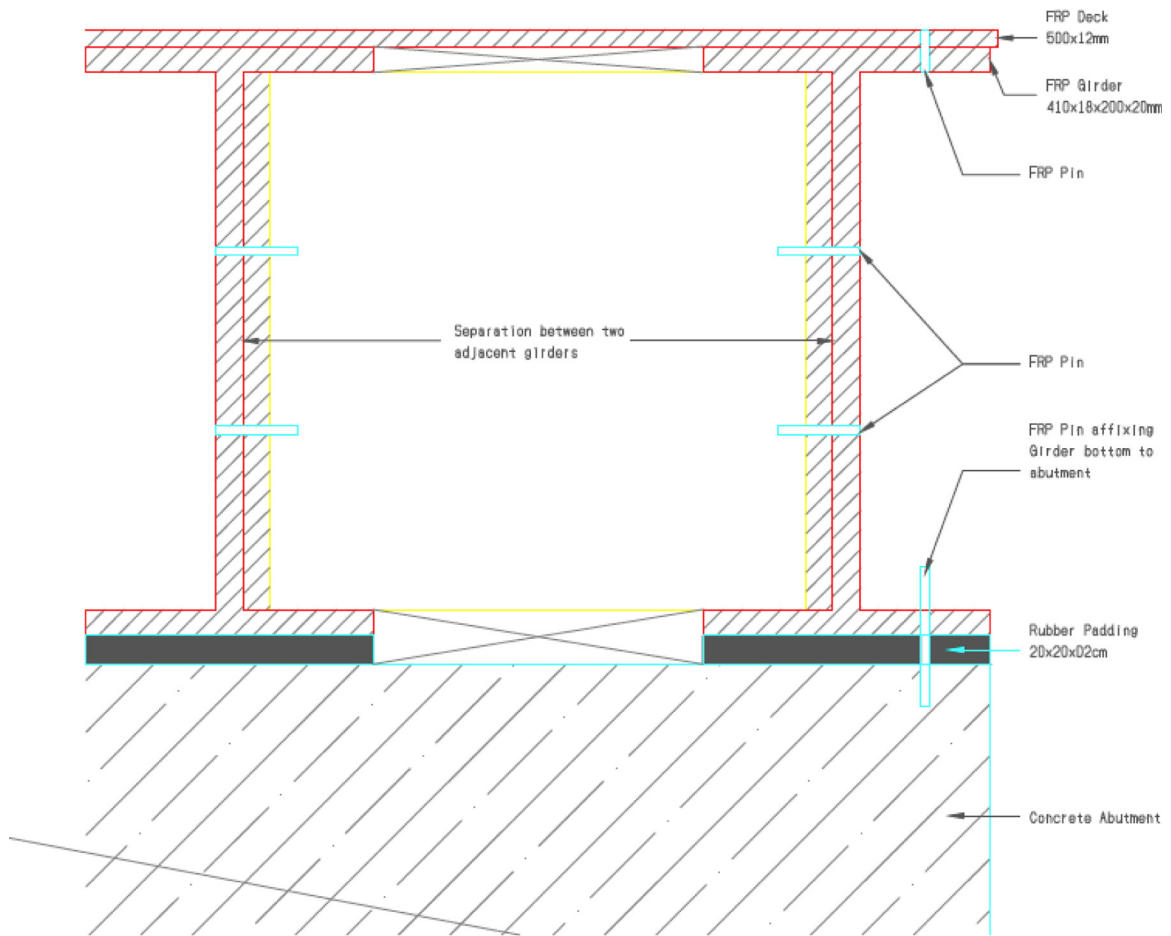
Detailed section view of the pedestrian bridge showing connection between girder, deck and abutment.
